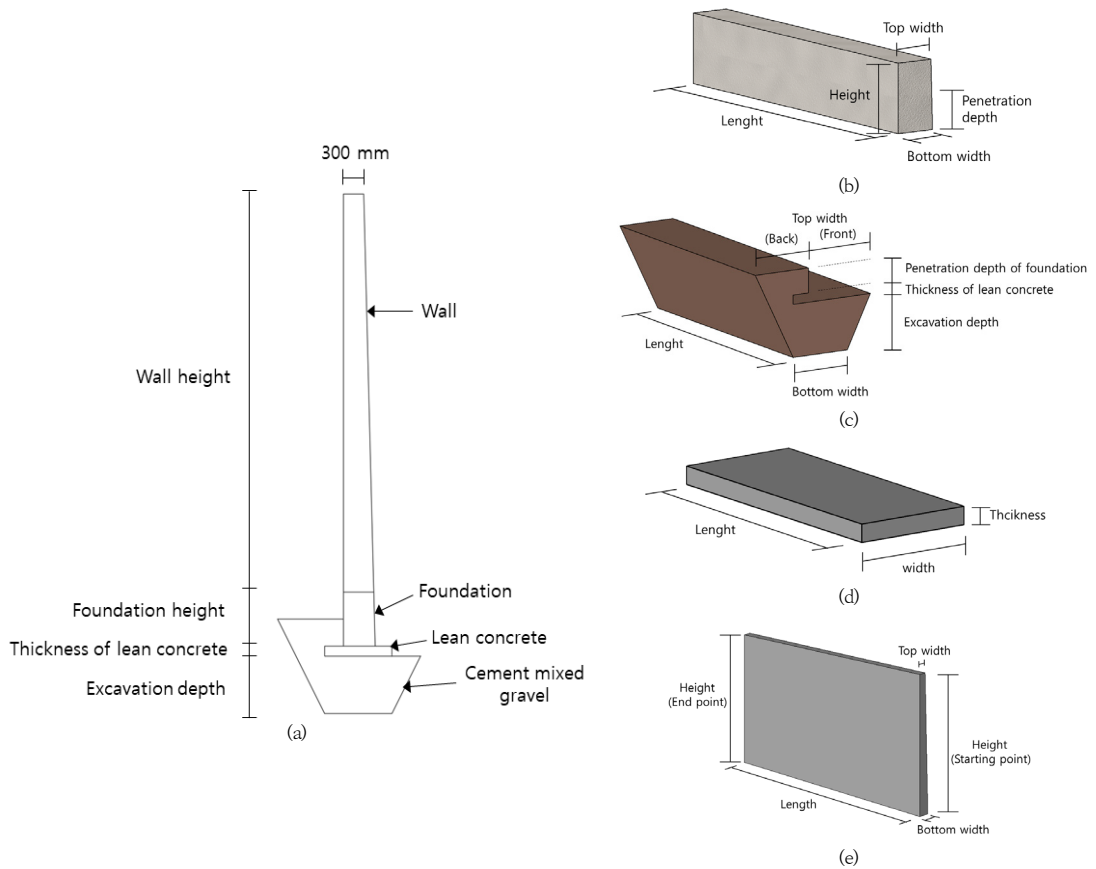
Construction detail of wall and foundation structure and 3D model of the members
